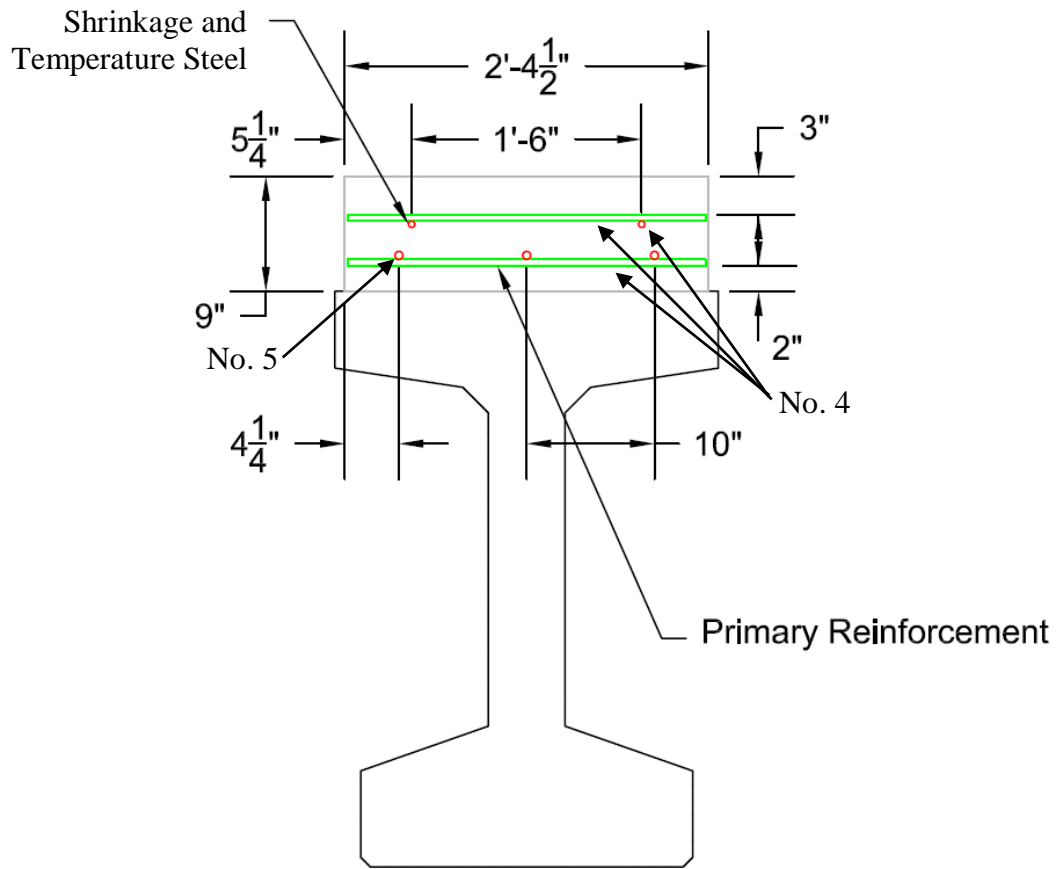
Cross-sectional view of deck dimensions and reinforcement layout
